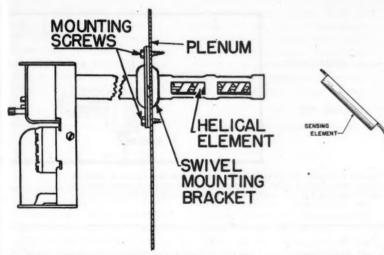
A — Plenum mounting of rigid element, LA401 Combination Furnace Control.
